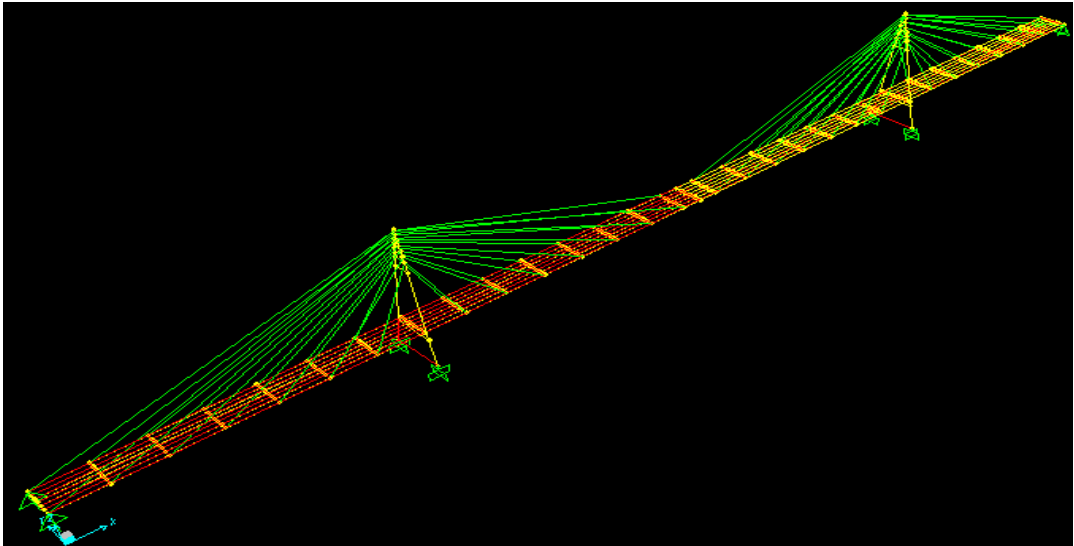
3-D finite element model of A-shaped pylon cable-stayed bridge
